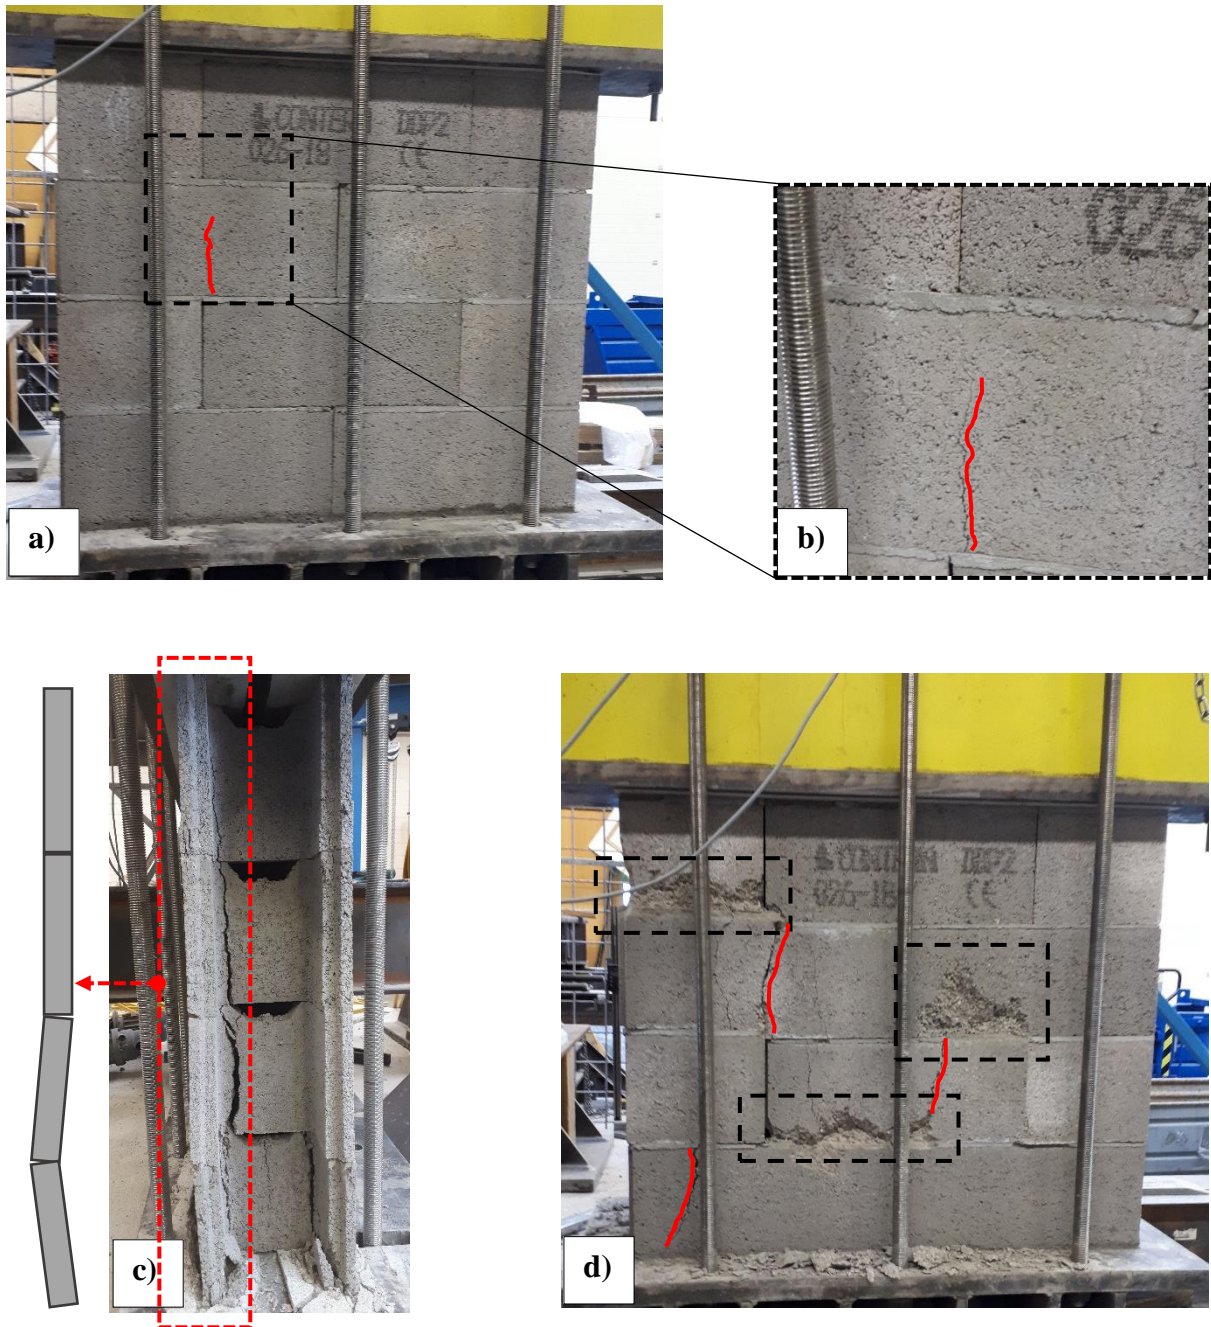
Damage mechanisms of the raw and the improved dry-stacked masonry wallets [121]
